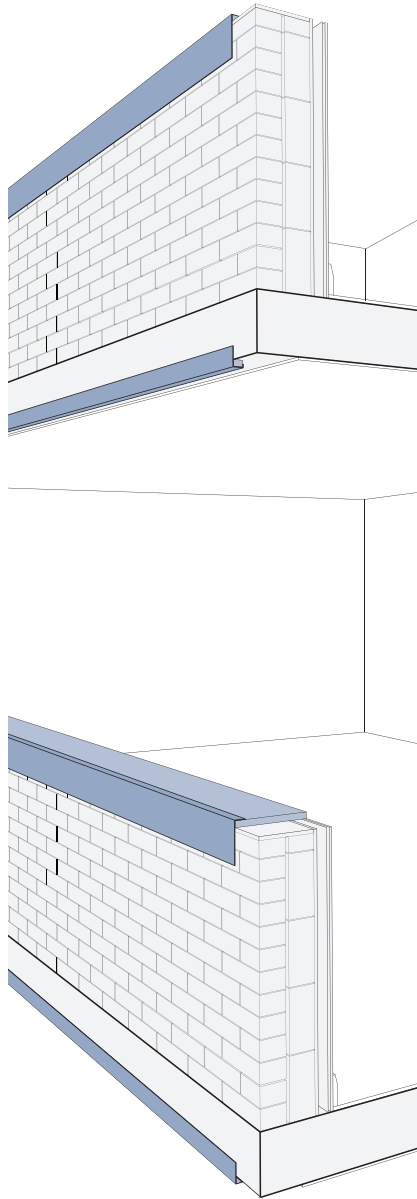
The process of wall overcladding and window replacement begins with the removal of the existing window(s). The existing rough opening has blocking installed on the window sill, followed by the placement of air/vapour barrier membranes that will subsequently overlap and tie into the air/vapour barrier system. Normally, this process begins at the top of the building and proceeds downwards so that debris and falling objects do not damage the newly installed components below. Note that the backing on the air/vapour barrier strips is retained until these later overlap and tie into the wall air/vapour barrier.
